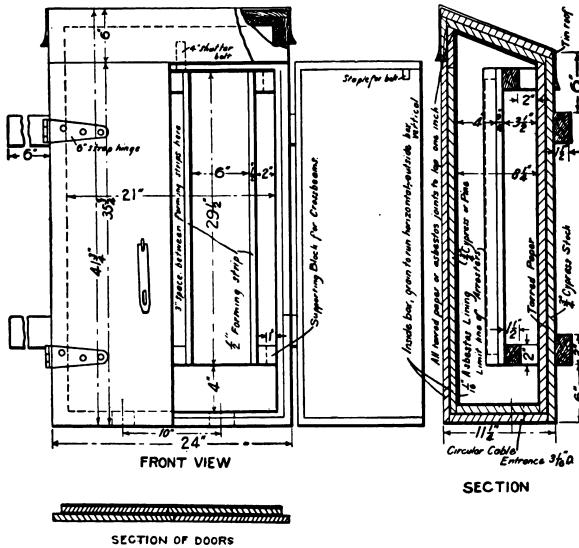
AERIAL LINE CONSTRUCTION, CABLE BOX.
